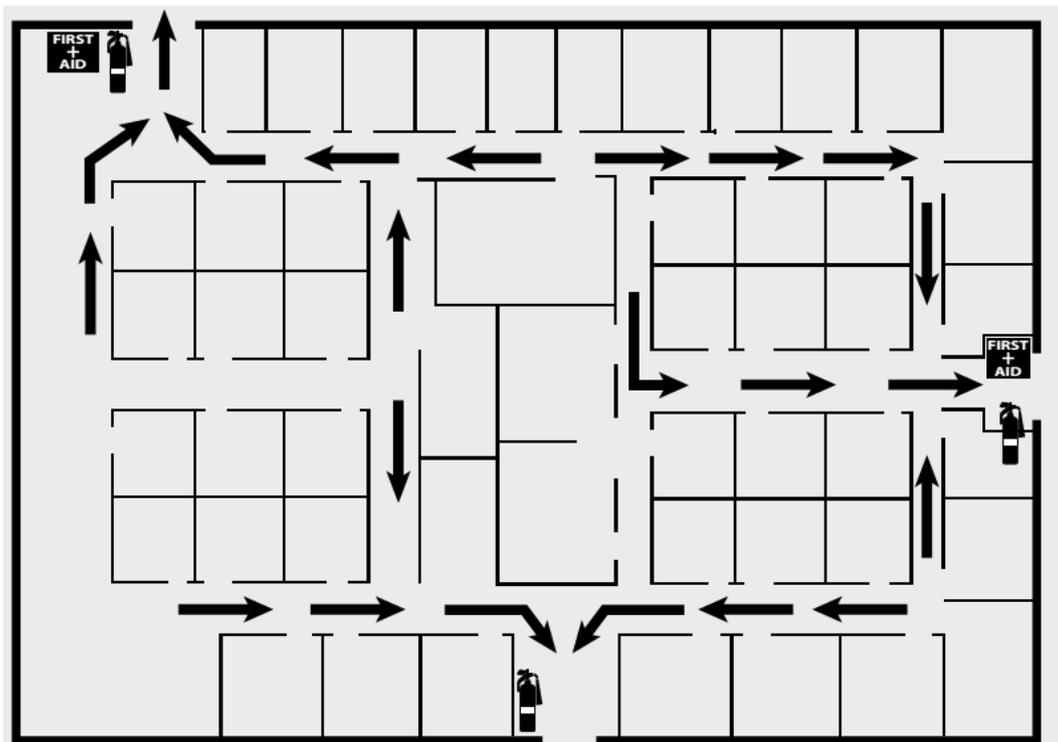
Exit route paths drawn on a floor plan (Occupational Safety and Health Administration, Fact Sheet- Emergency Exiti Routes, 2003)
